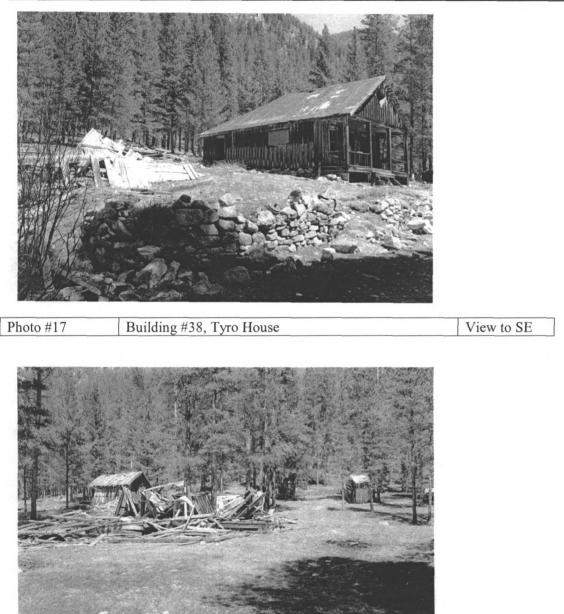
C	Overview of Building #40 and site #s 41 and 42	View to NE
